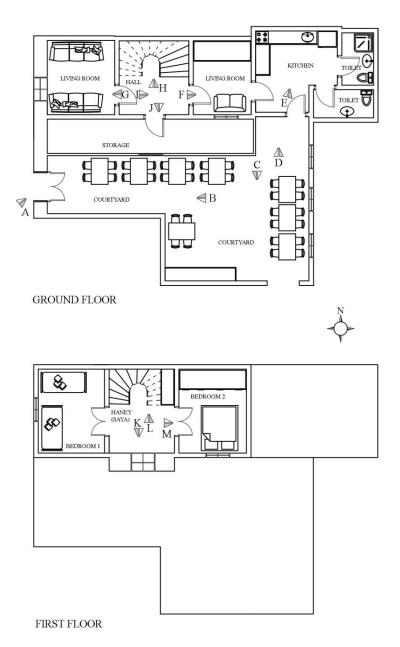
"Fikri Öndeş - Kapari Cafe" ground and first floor plans (S.Sevimbige archive, 2017)
